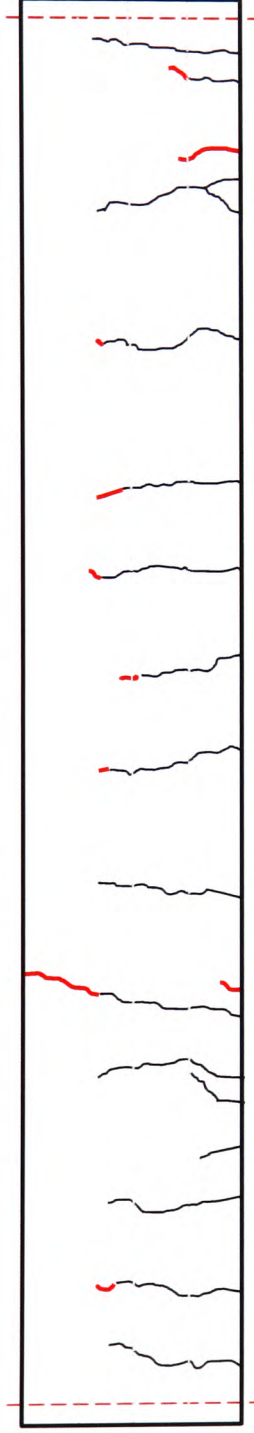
(b) – Schematic of crack pattern for 8CON within constant moment zone at failure
